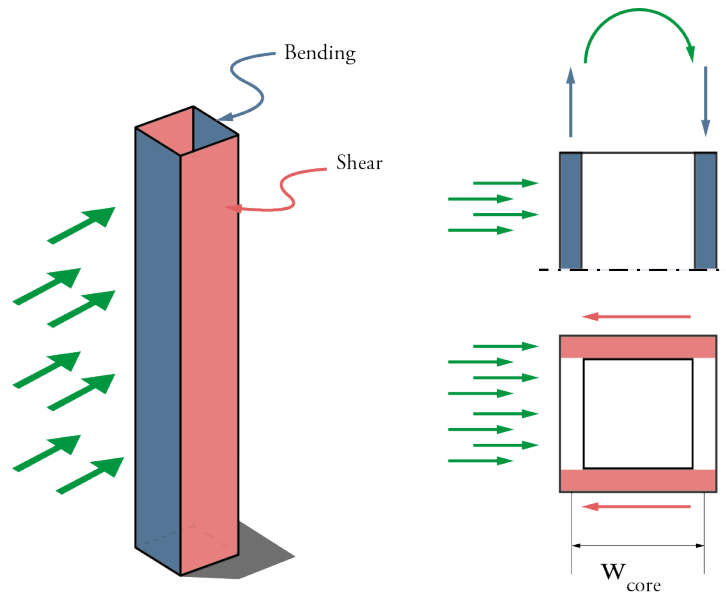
Sketch showing the way of modelling for designing the reinforcement of the core.
